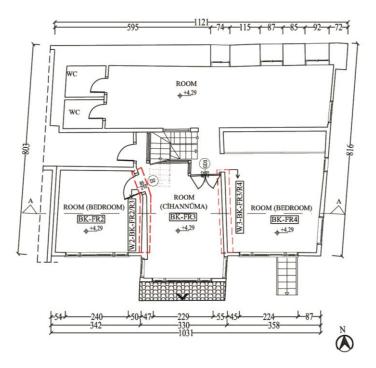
The first floor plan of Boyacızade Konağı in 1/100 scale (Redrawn by author).
